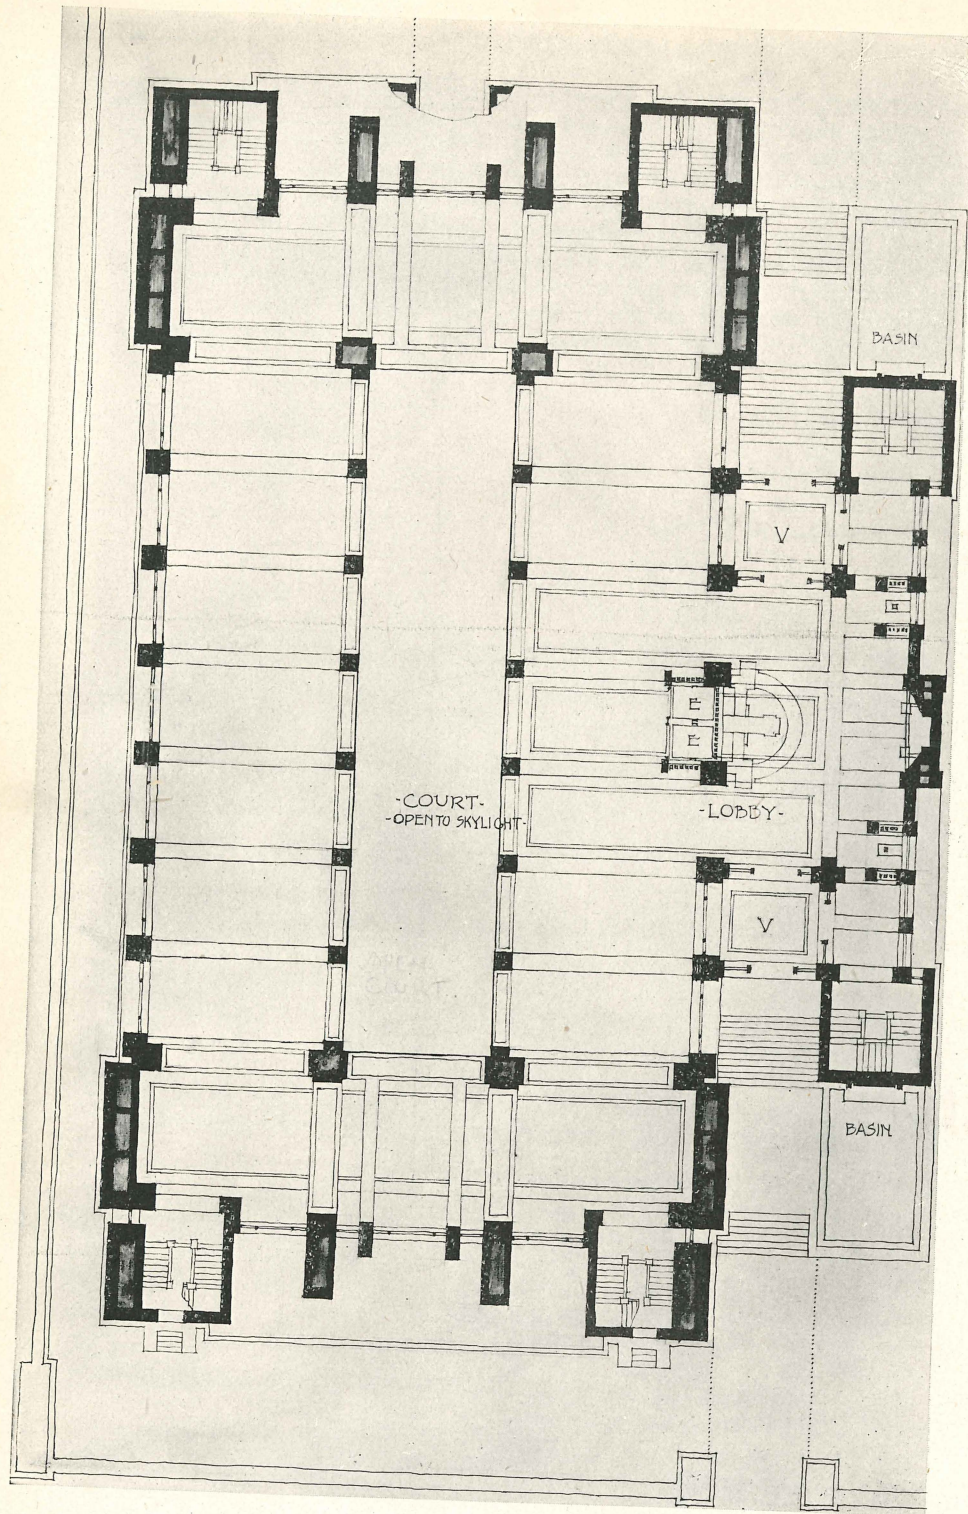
LARKIN BUILDING—MAIN FLOOR PLAN.
